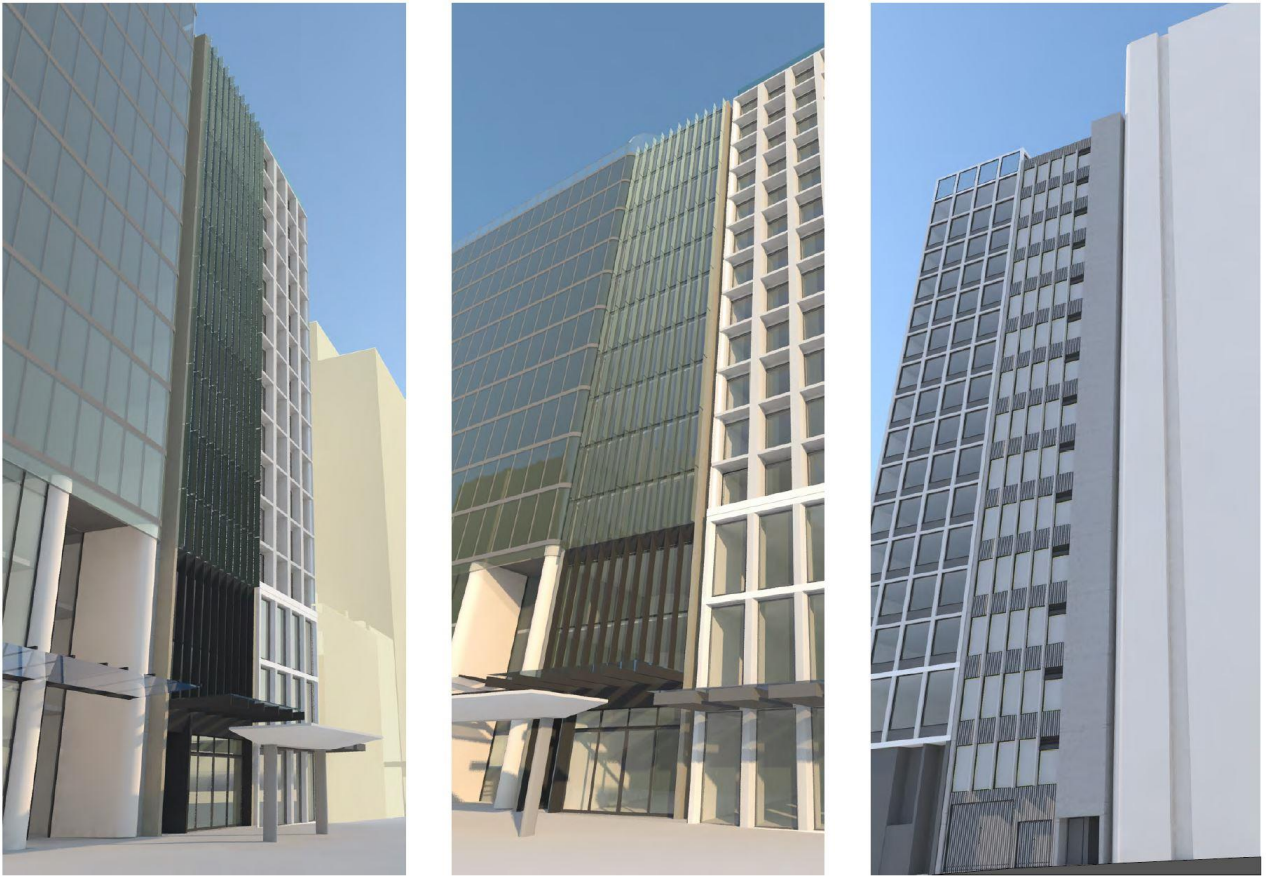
Renders (left to right): view from George Street looking north-east, view from George looking south-west and view from Wynyard Lane looking east, showing 333 George Street (left), subject site (centre) and 323-325 George Street (right, as approved)
